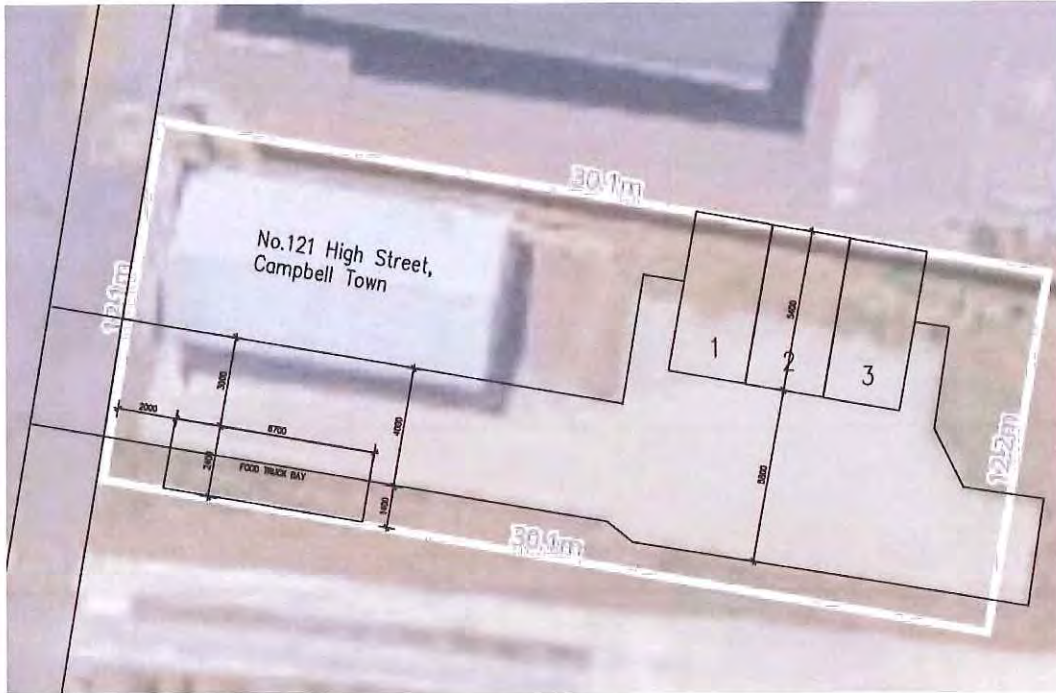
Site Plan showing Proposed Food Truck Bay and Formalised 3-Space Parking Area
